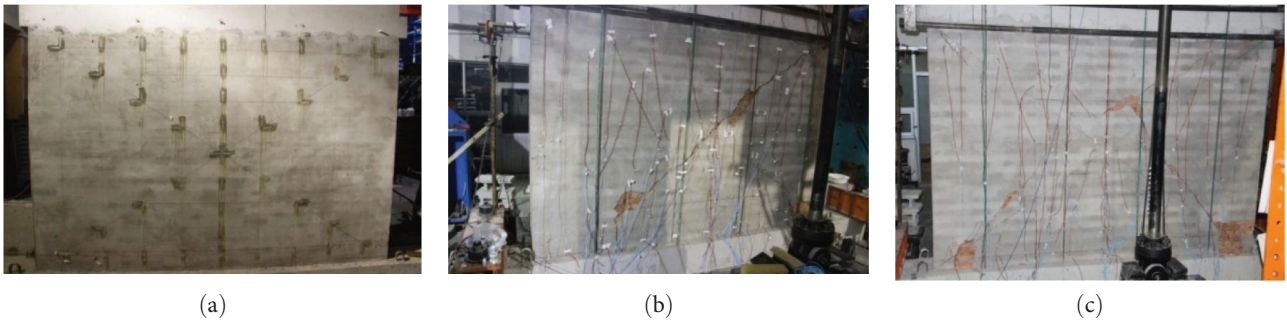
Photos of wall damage. (a) Unreinforced wall piece. (b) Wall piece with intelligent strand. (c) Wall piece without intelligent strand.
